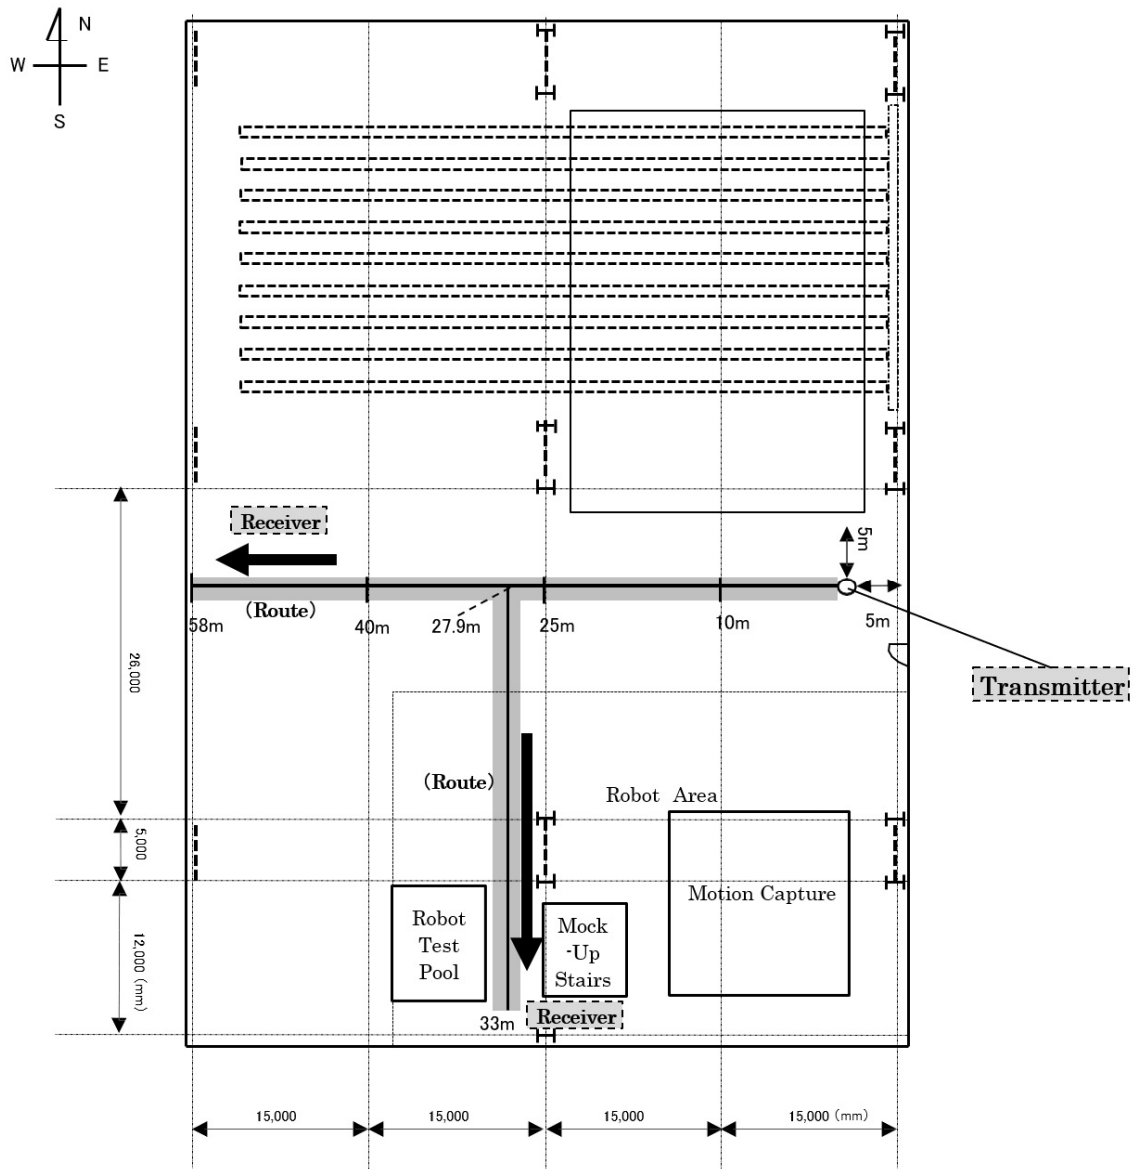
Ground Floor Plan of the Full-scale Mock-up Building
